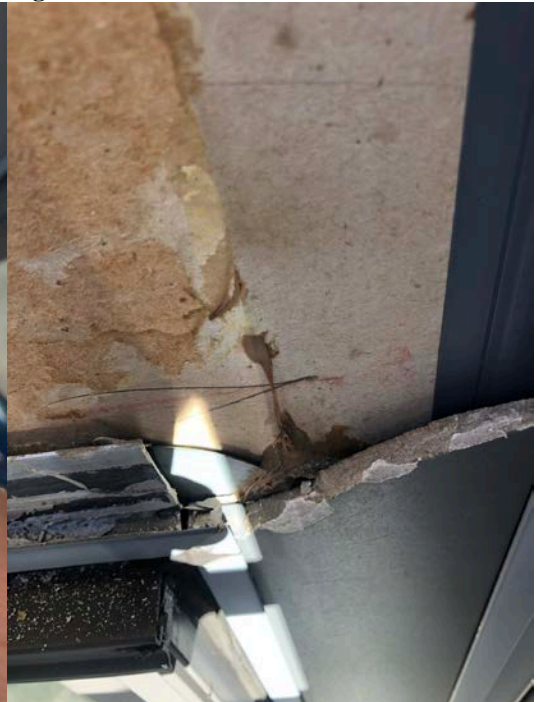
Water Infiltration and damage at Soffit Panel
